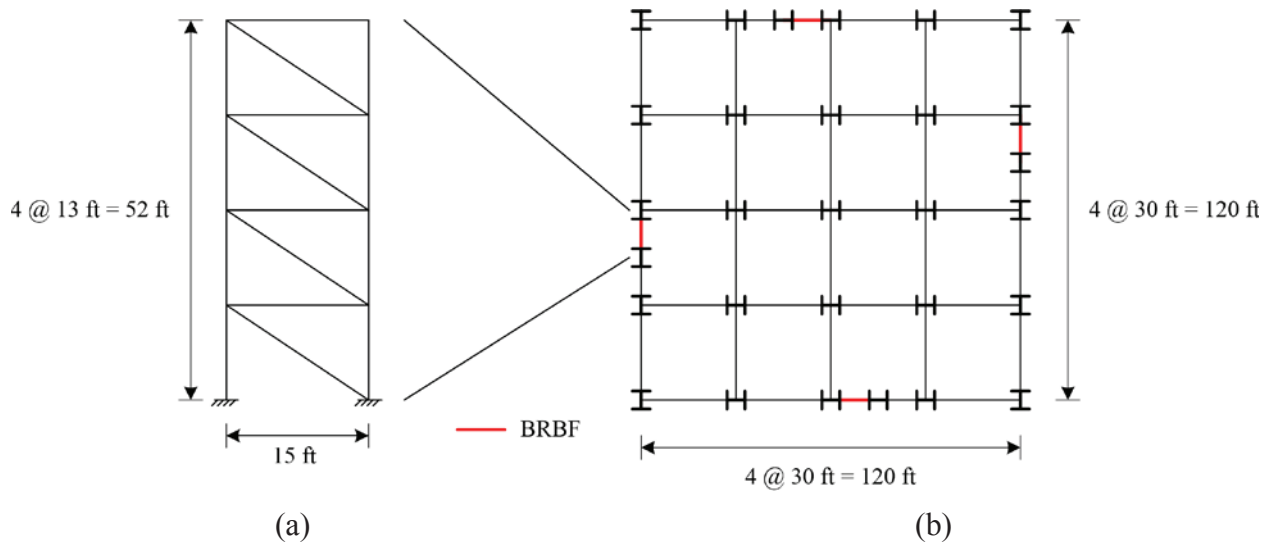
Four-Story Buckling Restrained Braced Frame (a) Elevation and (b) Plan
